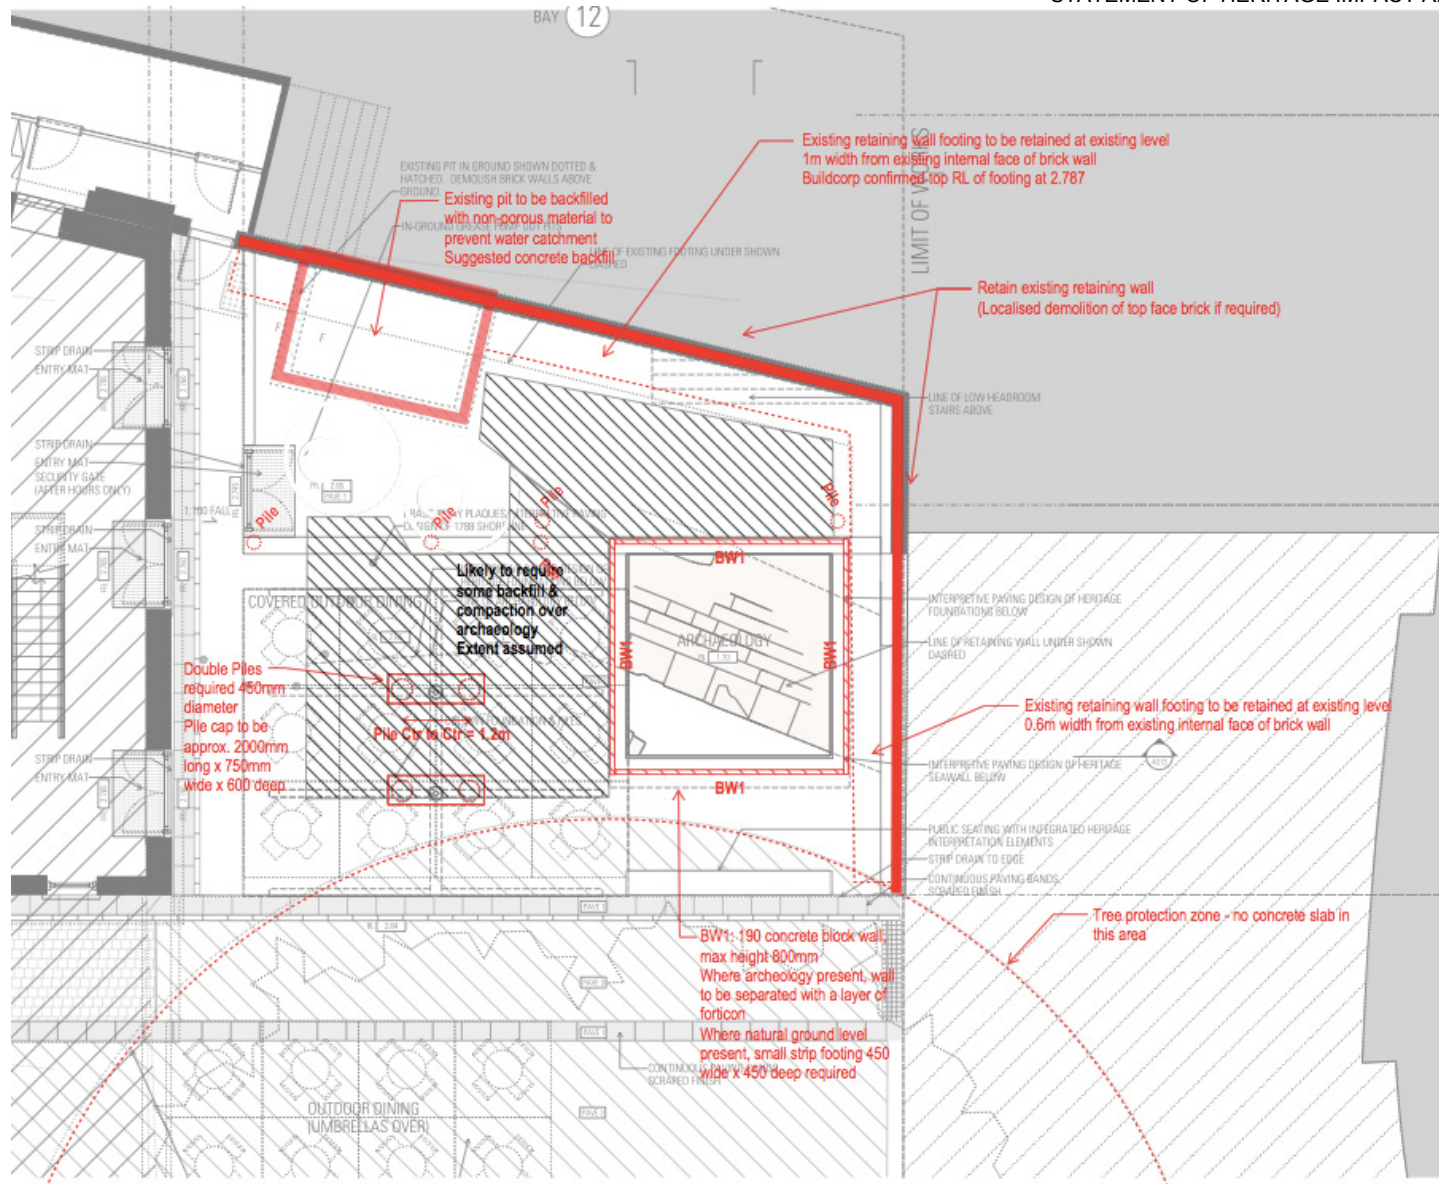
Level 1 plan showing details of block wall around the archaeological viewing window, locations of piles to support toilets, and piles and pile caps to support the outdoor awning columns. Note north is to rhs of page. (Source: TTW 180228_Bay 12_Archaeology S96_TTW Structure Preliminary)
